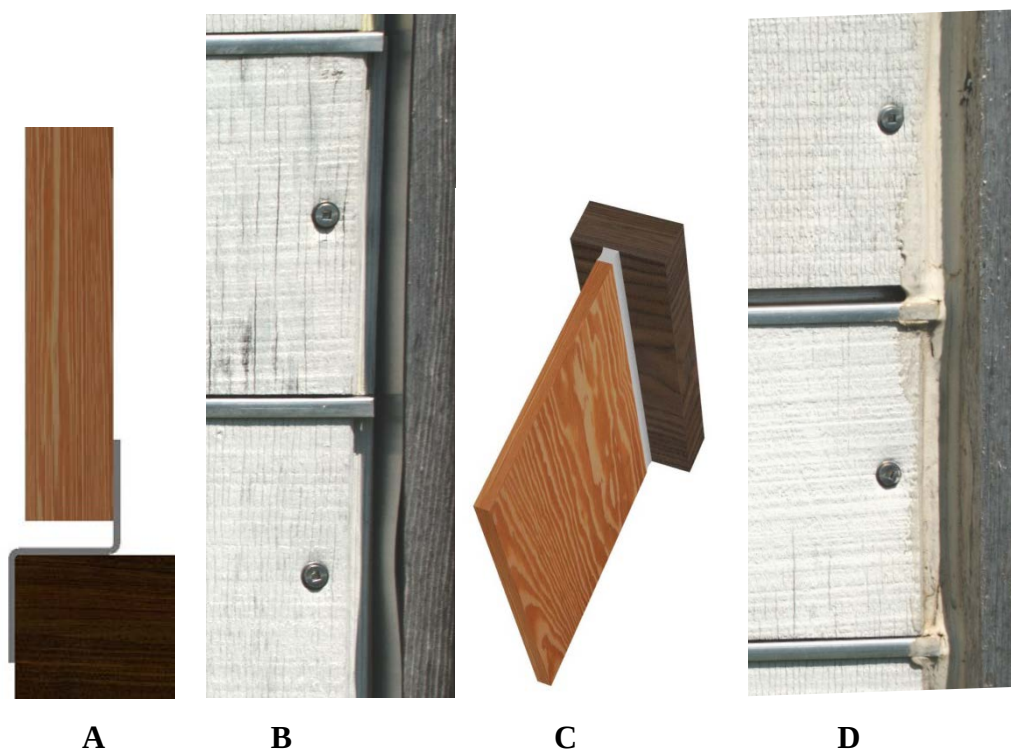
End and bottom finishing details. A, schematic view from top of flashing between panel and trim. B, photo of flashing at end of panel. C, schematic of caulk joint. D, photo of caulked joint on end of test panel. D also shows a gap below the board (upper) and no gap (lower).
